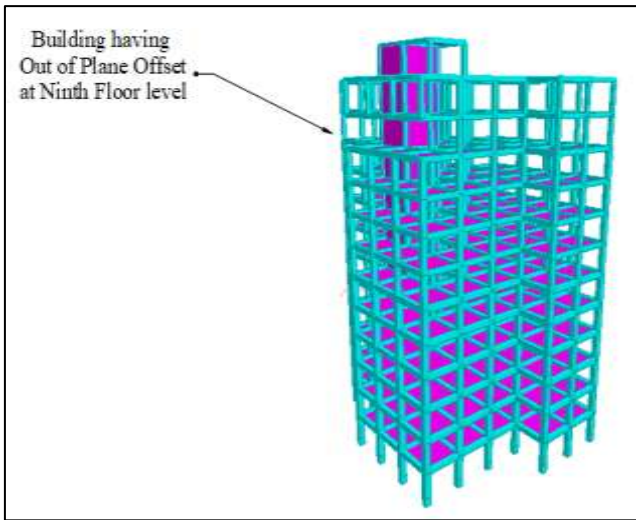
OPO Case 6- Residential Apartment having out of plane offset provided at 9th floor level
